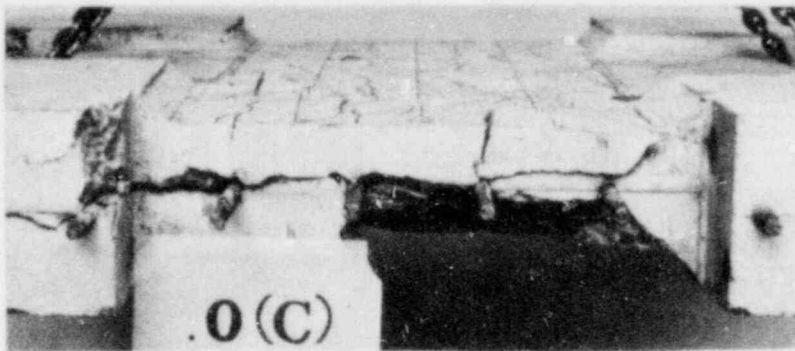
Splitting cracks due to biaxial tension (part of the specimen is shown).
